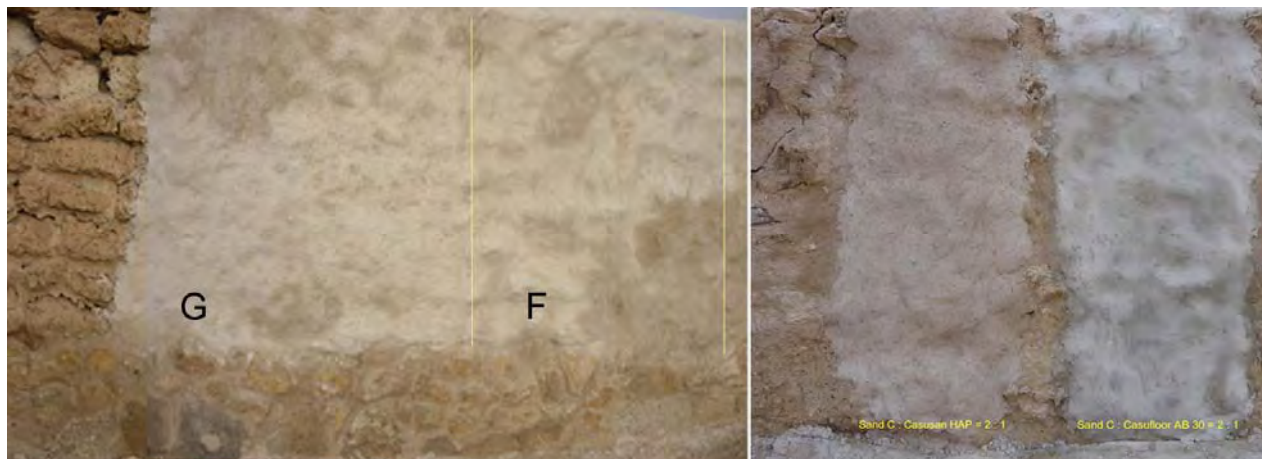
Test fields with anhydrite mortar for plastering at wall of tower no. 8
